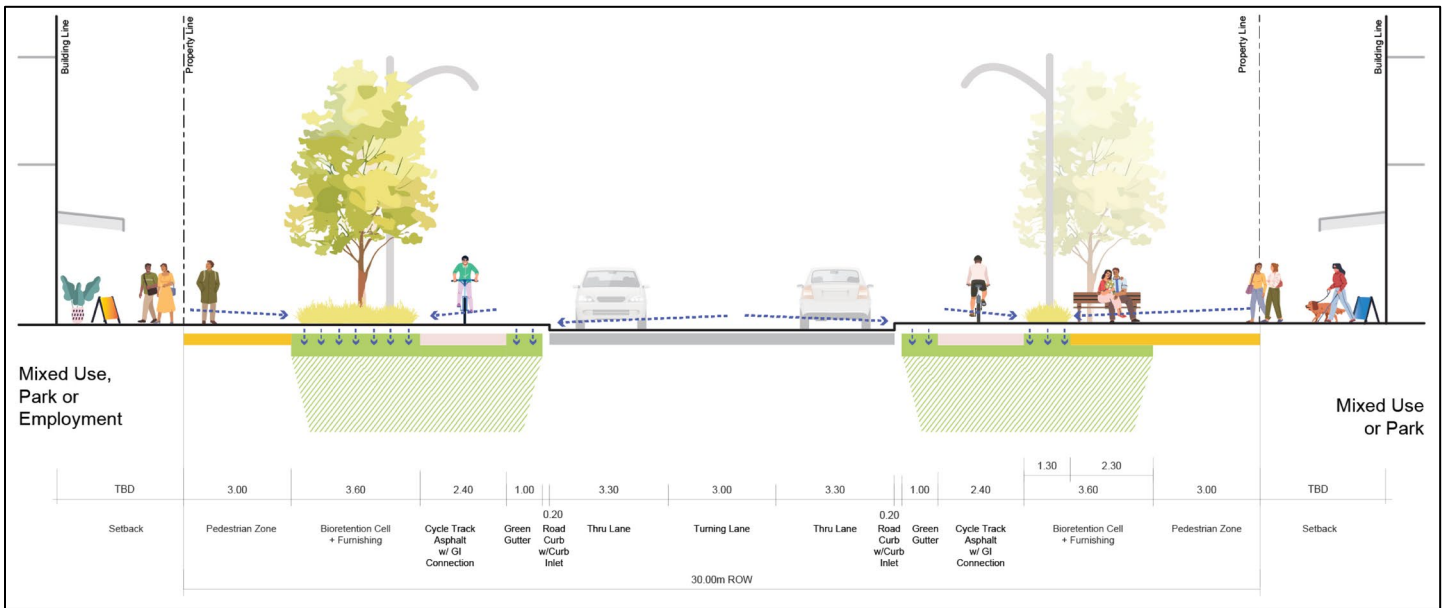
Dufferin Street (Northern Street to Sheppard Avenue West) Cross-Section - Option 3
